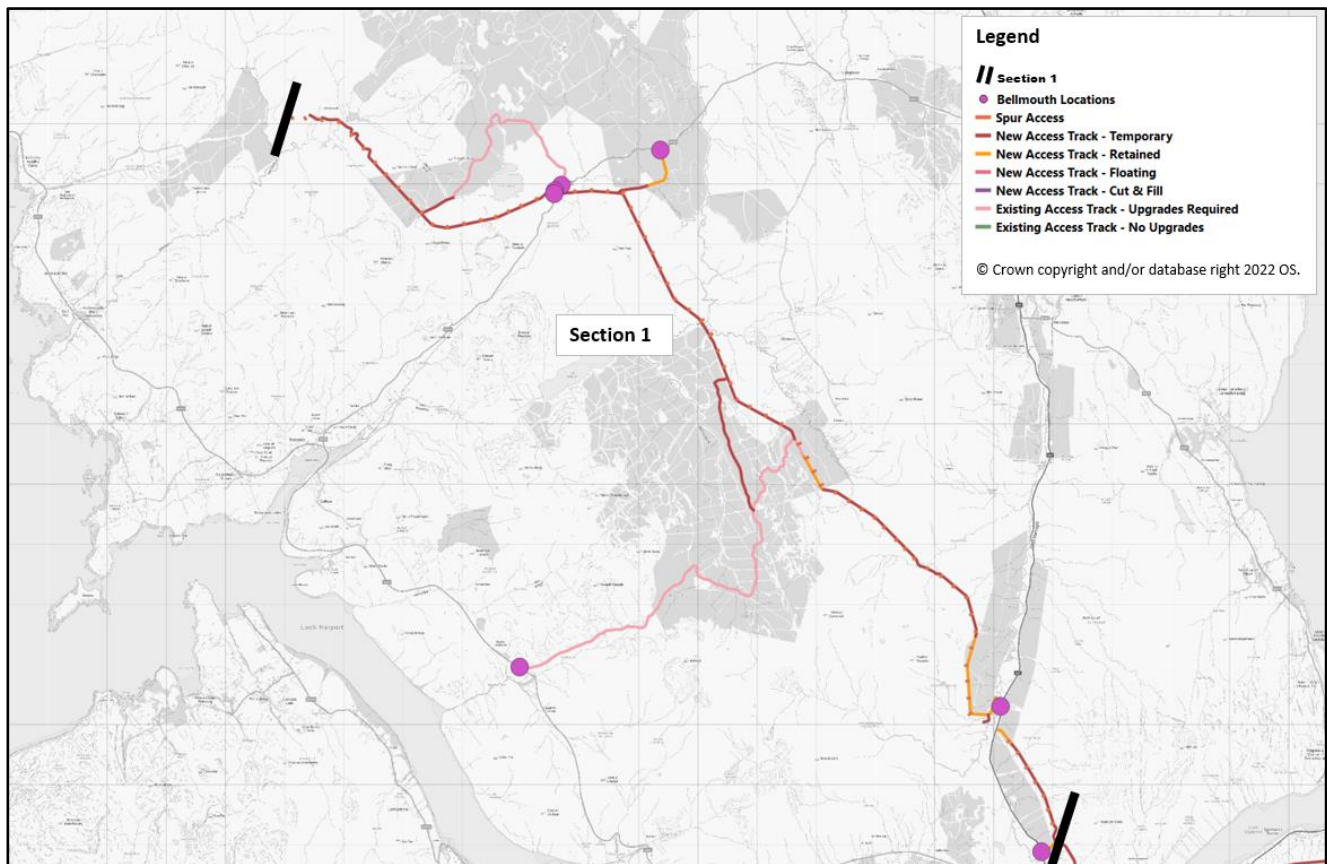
Access Locations – Section 1: Edinbane to North of Sligachan
